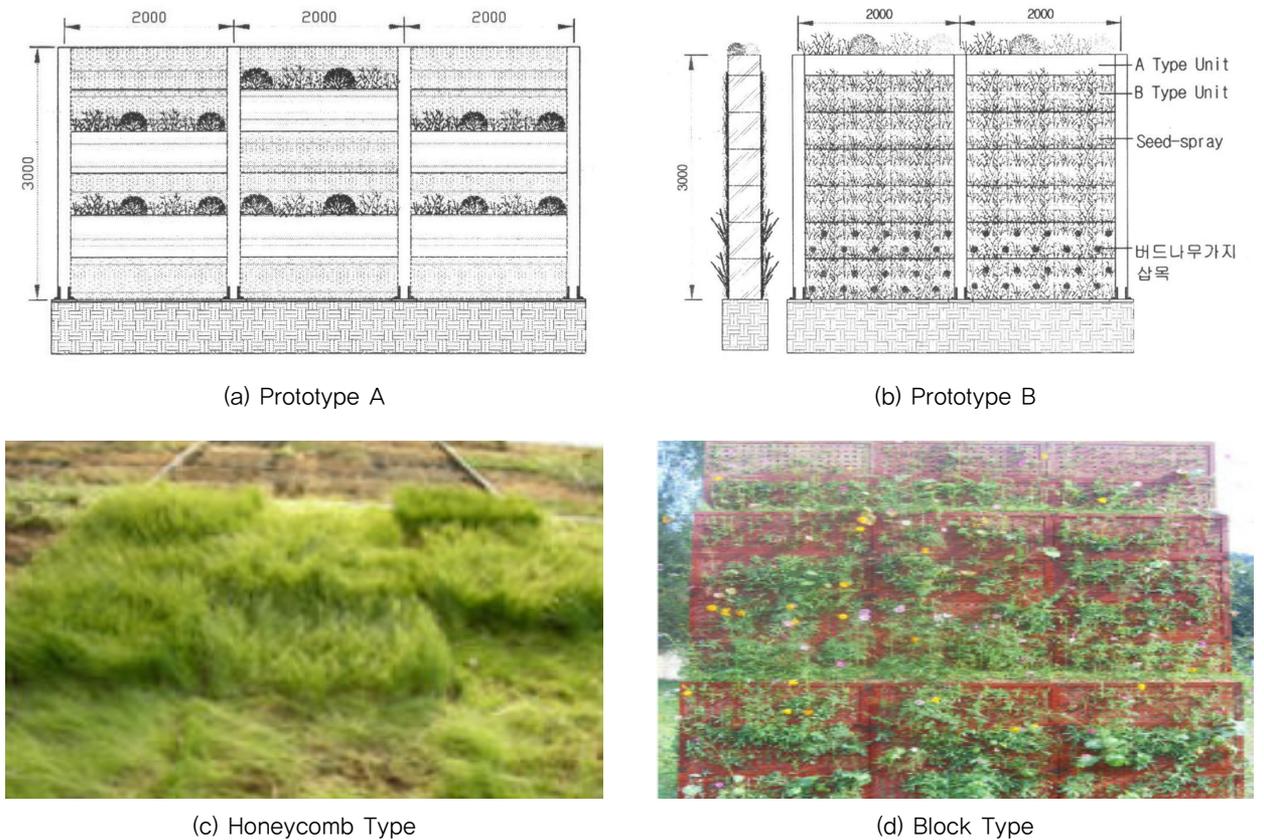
Vegetative-soundproof Wall Based on Artificial Planting Foundation Developed in Korea
